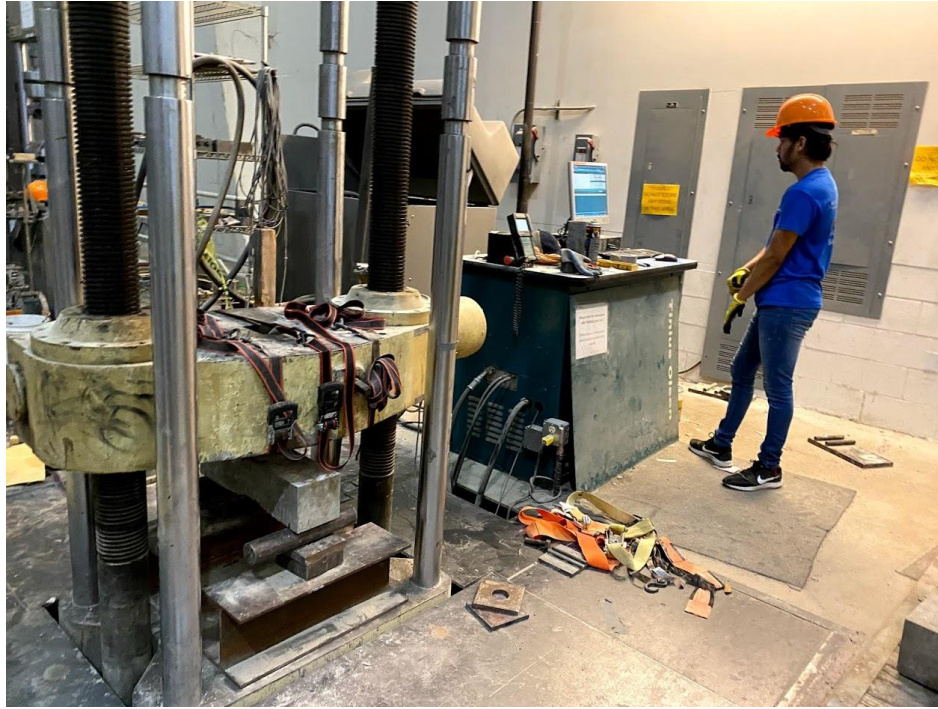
Flexural Testing of Steel Joists Encased in Concrete Beams
